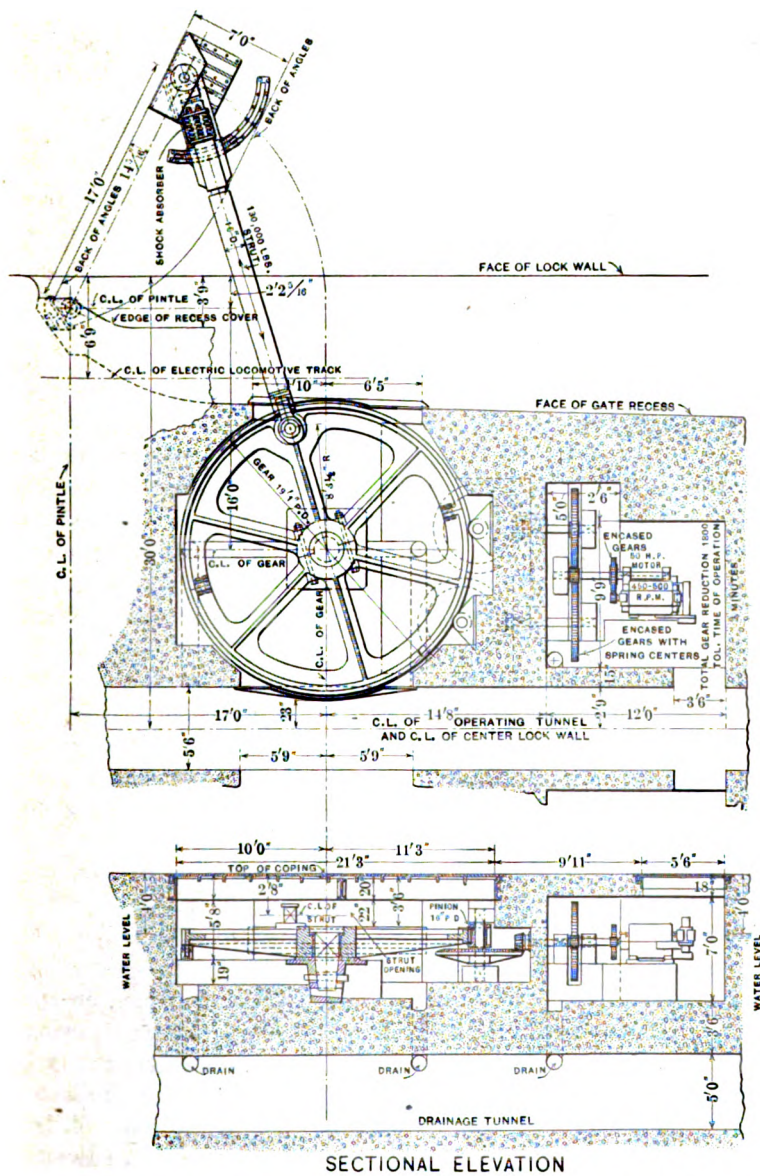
OPERATING MACHINERY FOR LOCK GATES.
